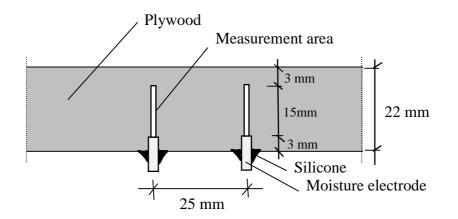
Detail of plywood in timber frame roof section showing location of a pair of moisture electrodes.
